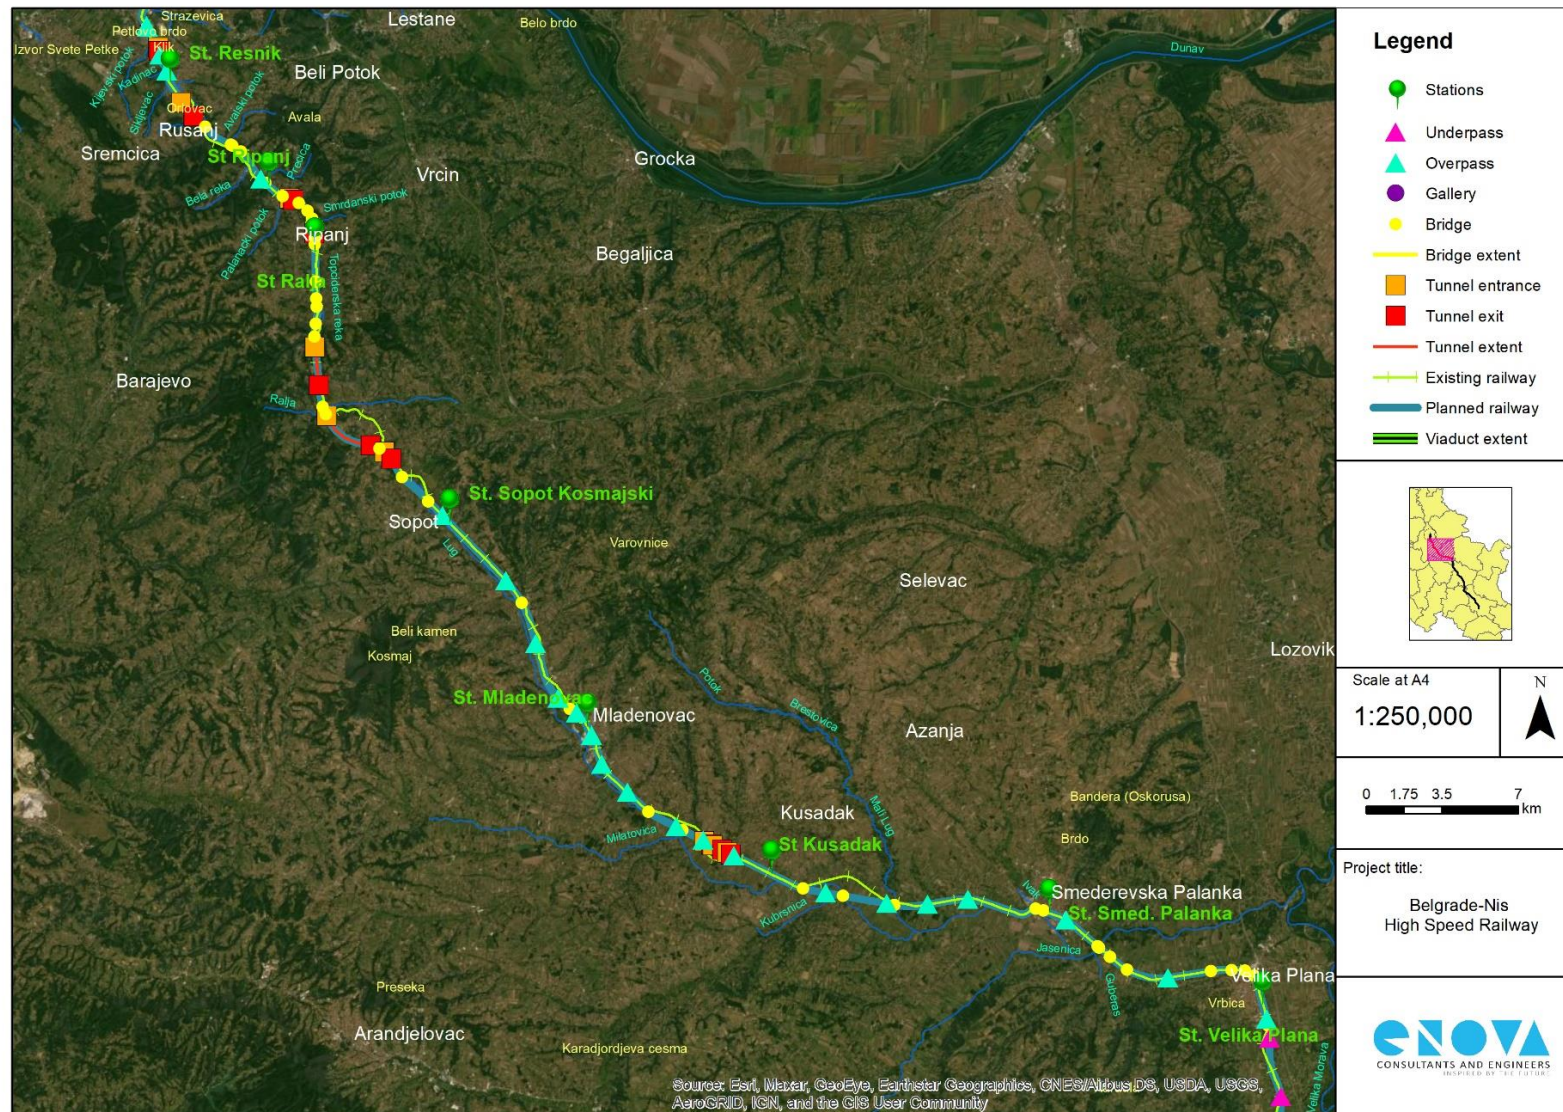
Existing and planned railway with ancillary structures (Resnik-Velika Plana subsection)
